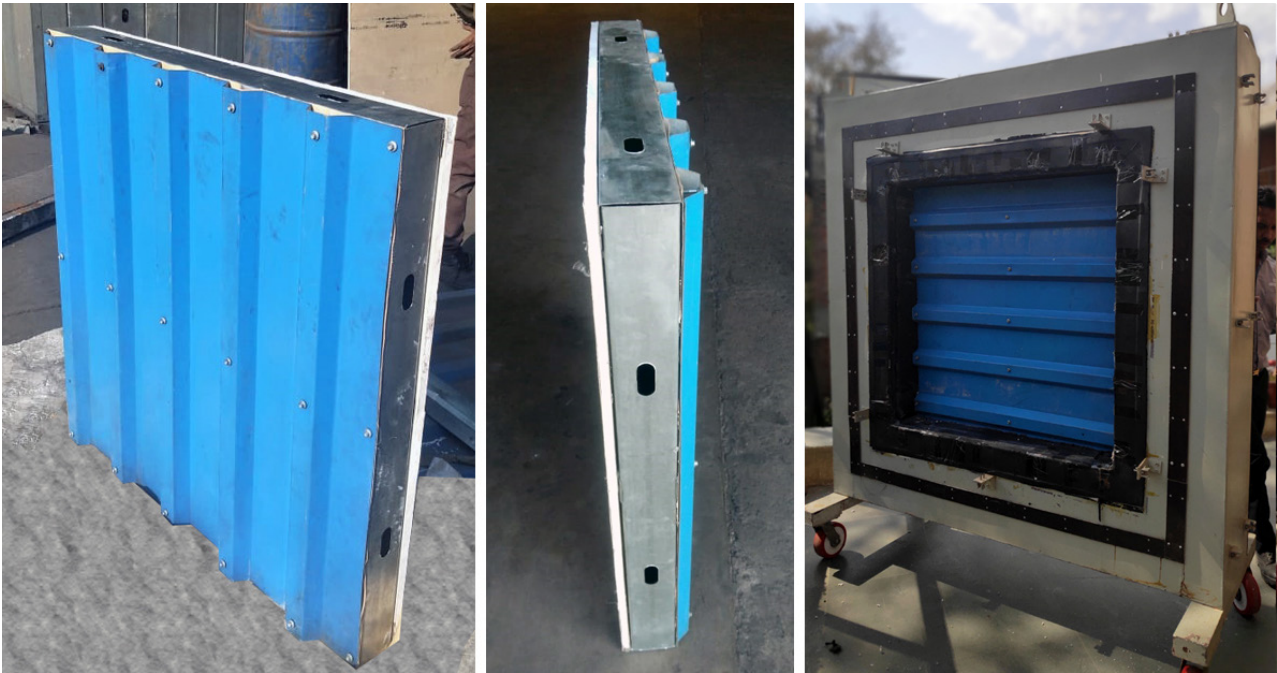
Photograph of LGFSS with PPGL sheet wall sample (left) & the sample installed within specimen frame of GHB (right)
